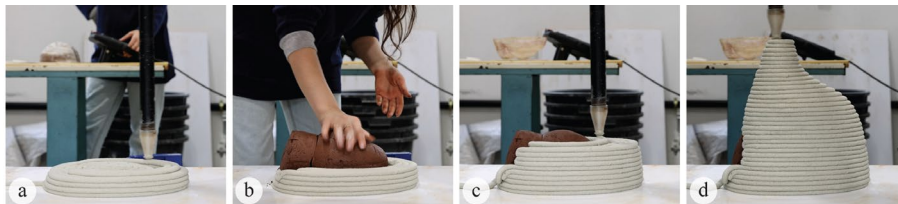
1:3 scale tabun fabrication: base printing (a); dome placement (b); body printing on soil support (c); final structure (d)
